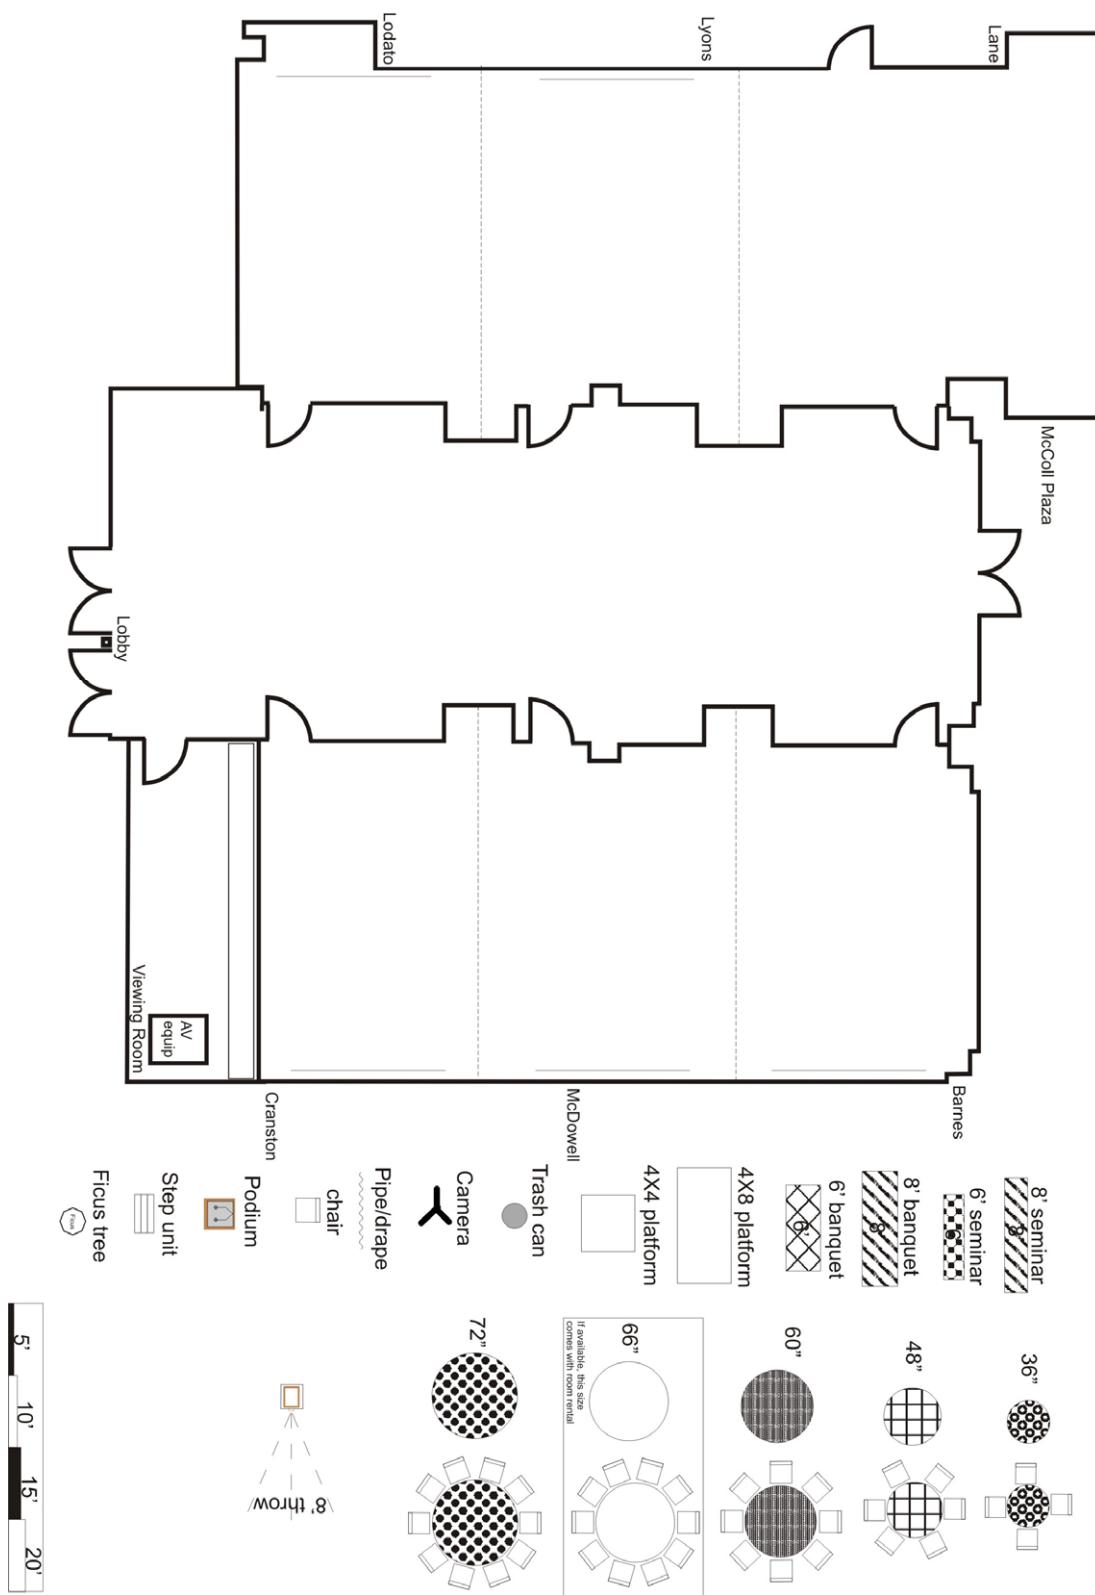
Fisher Rooms Floor Plan and Seating Styles
